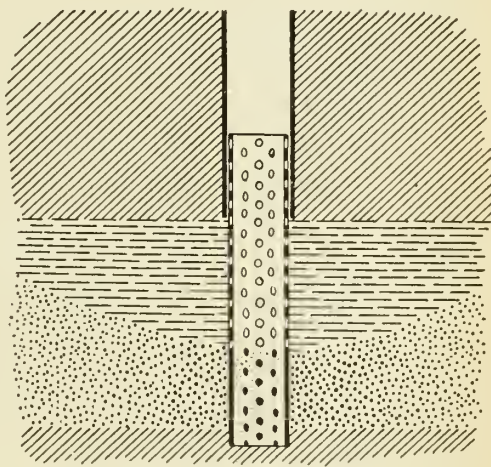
Strainer with holes, showing lower part filled with sand.
